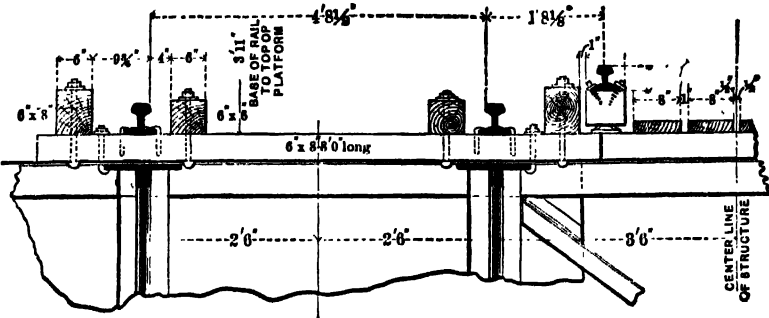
Cross-section of Floor for the Northwestern Elevated Railway and Union Loop Elevated Railway in Chicago.
